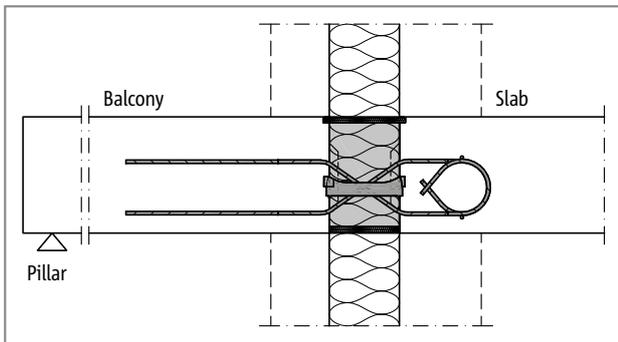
Schöck Isokorb® XT Type Q: Connection with non-load-bearing cavity masonry
